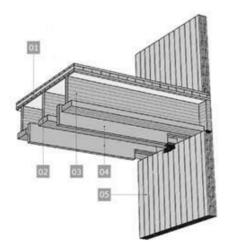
Example of a cassette floor element (Swedish wood, n.d).
